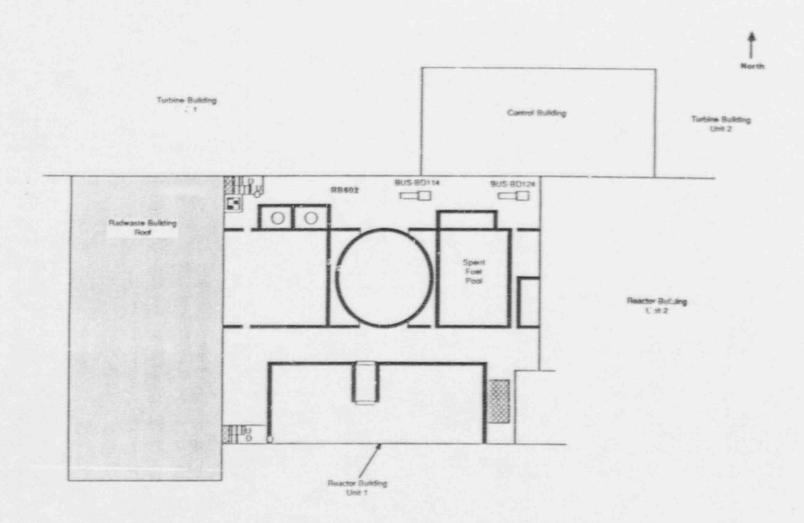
Limerick 1 General Arrangement, Elevation 313'
